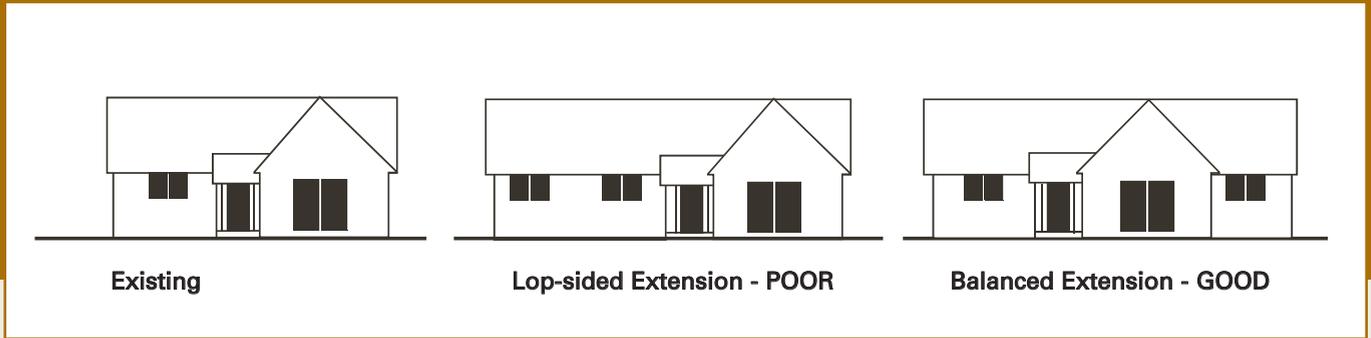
MAIN FRONTAGE GABLE - creating a balanced elevation
